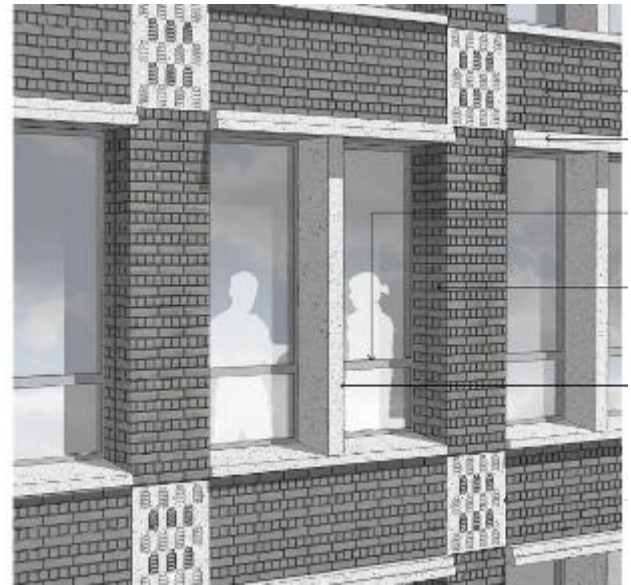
Benjamin Street projecting corner and proposed Elevational treatment
